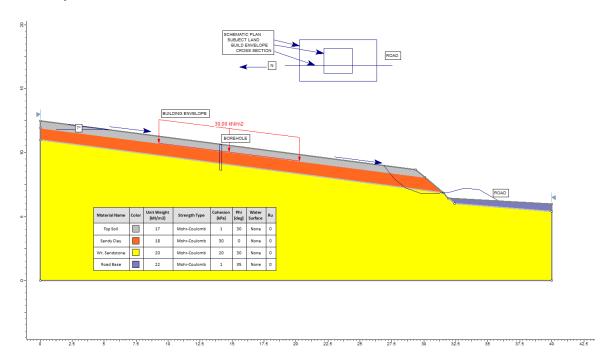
Slope model with proposed build envelope and possible failure modes.(Author).
